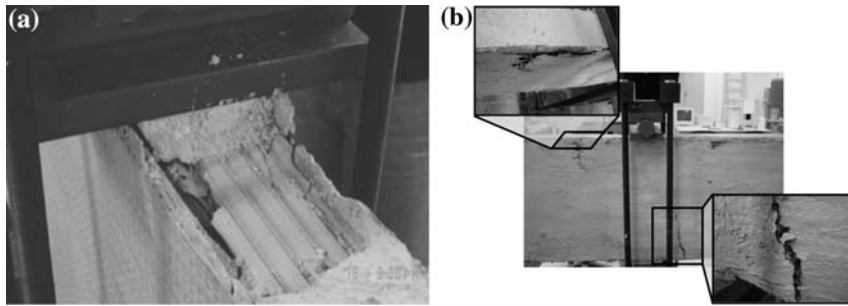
(a) Limited debonding of the jacket and brick compressive crushing near the mid-span (specimen C_R1); (b) Flexural cracking (of the wall and the jacket's
